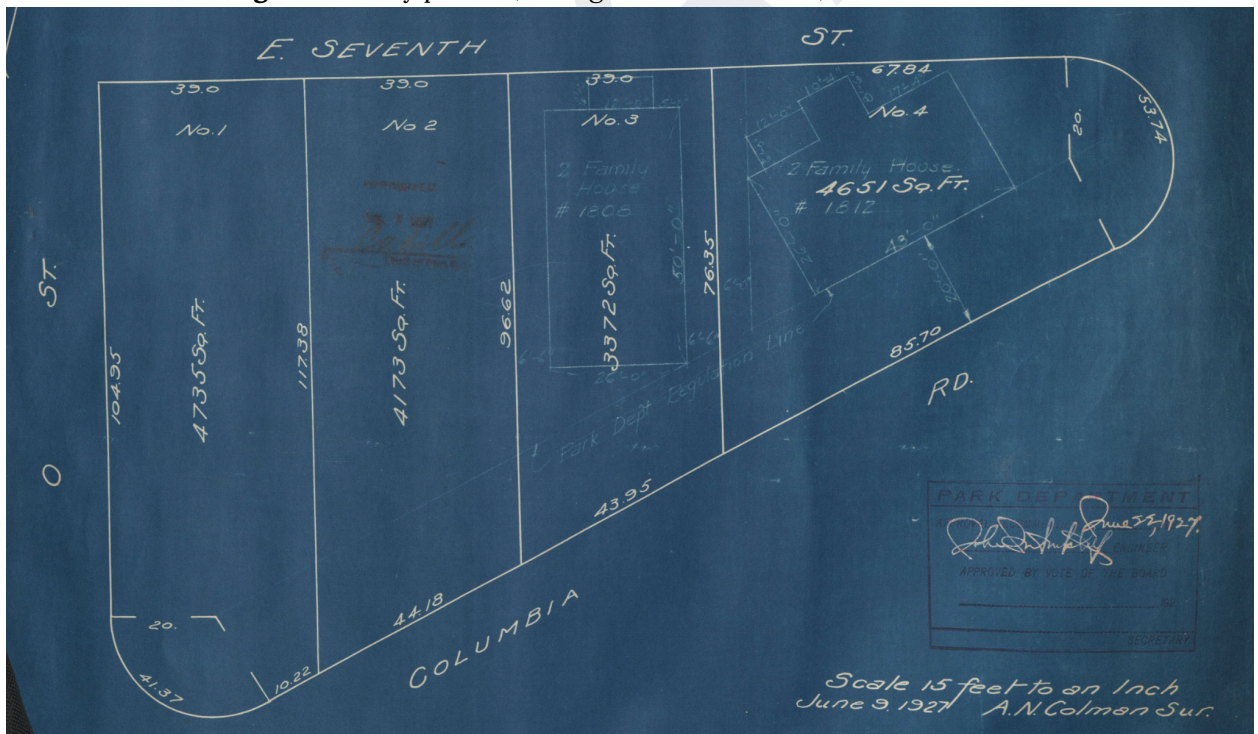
Site plan of 1808 and 1812 Columbia Road. City of Boston Archives.
